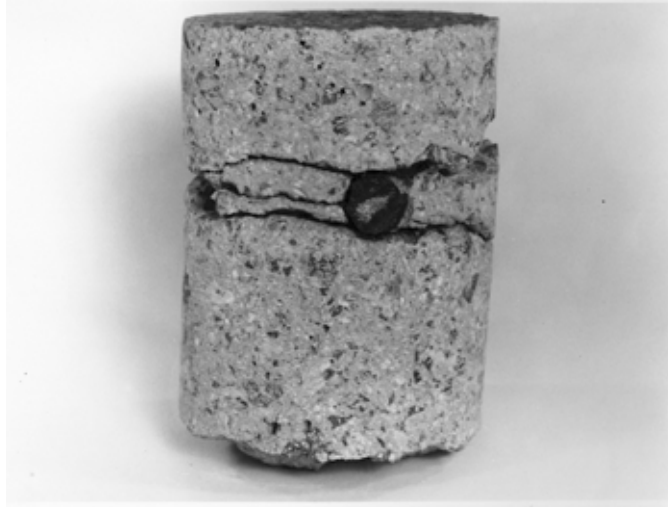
Delamination around reinforcing bars (there is no cracking on the surface).
